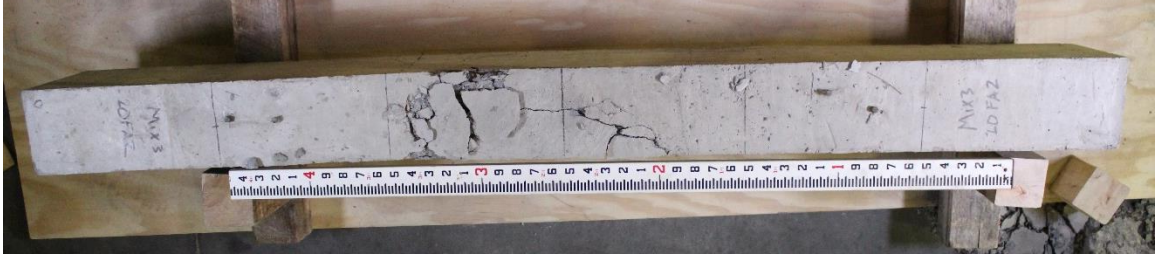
Mixture 3 (20FA2) beam #20: concrete beam top view.
